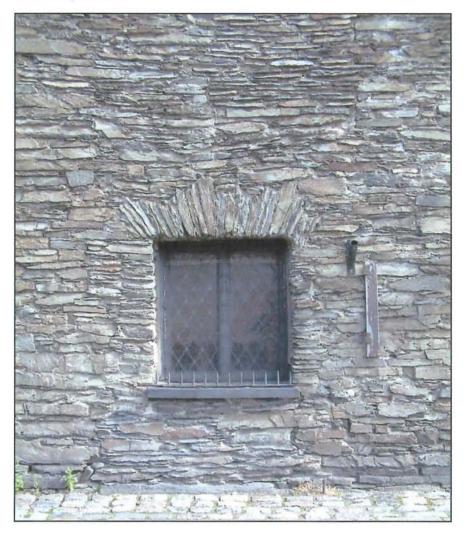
Window at east end of south elevation with blocked door and window openings (Photo CPAT 1694.08)
